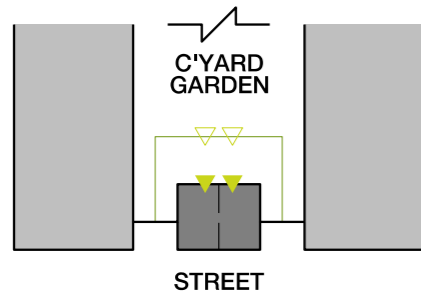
Plan diagram: First floor frontages behind Townhouses.
